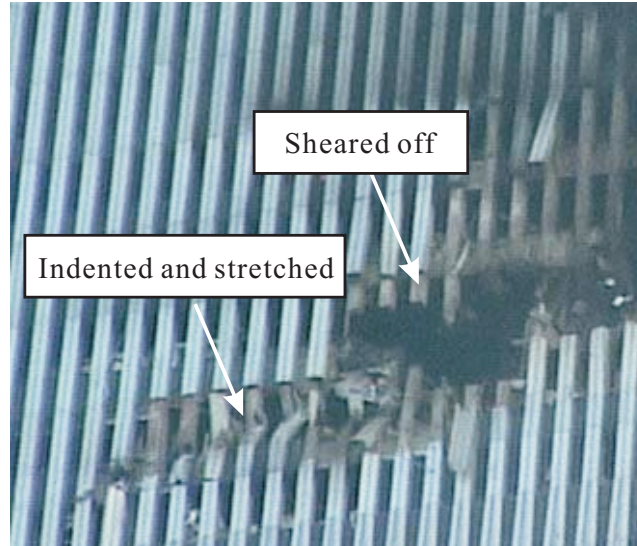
A close-up view of the damaged exterior columns of the south facade of the South Tower of the World Trade Center [127]. ©C. Sorensen.
